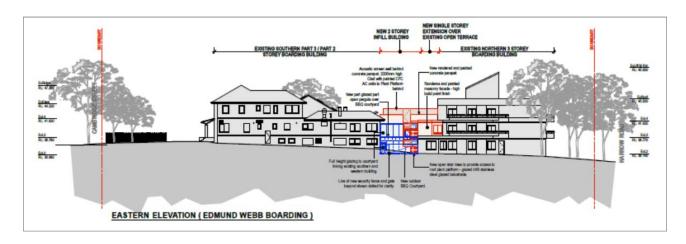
Proposed Eastern (Side) Elevation of Edmund Webb Boarding Facility
